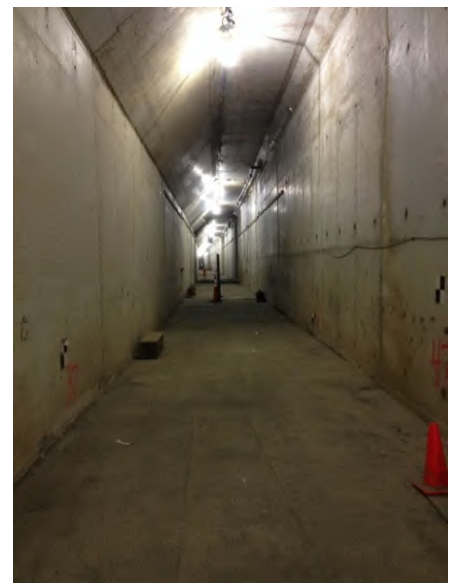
View down emergency corridor. Wall on right is interior wall; wall on left is tunnel liner.
